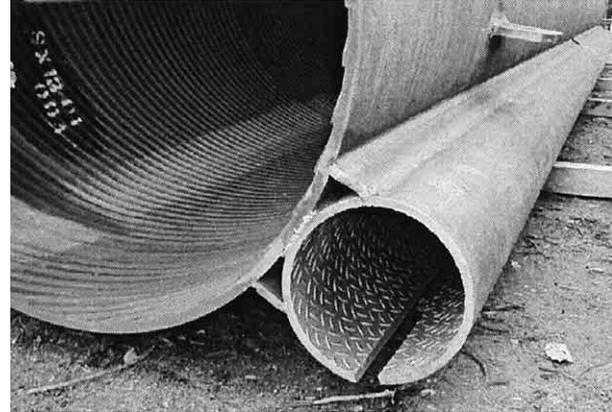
High strength pipe-junction pipe and steel pipe with inner rib
